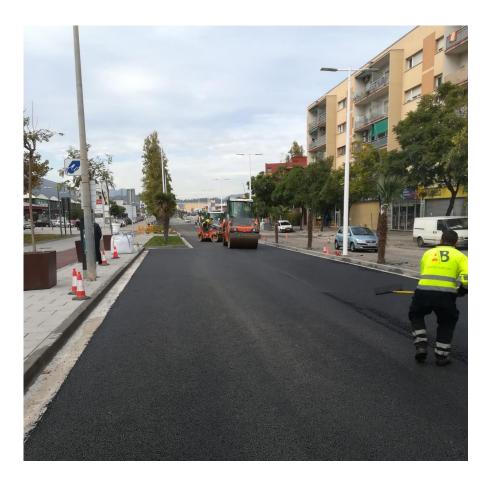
Carrying out asphalting tasks on the road (Civil Stone)
